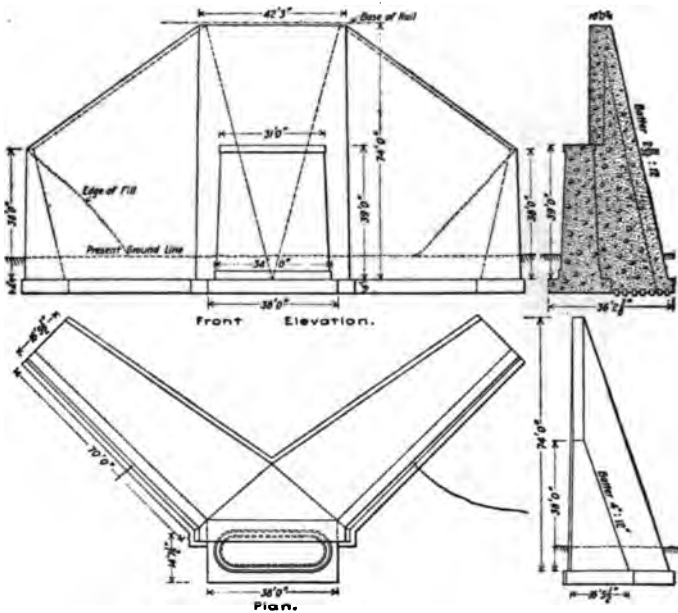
Wing Wall Abutment, Cairo Bridge.
